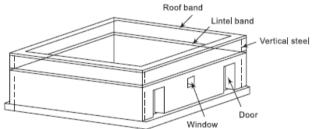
Overall arrangement for reinforcing a low-strength masonry building
